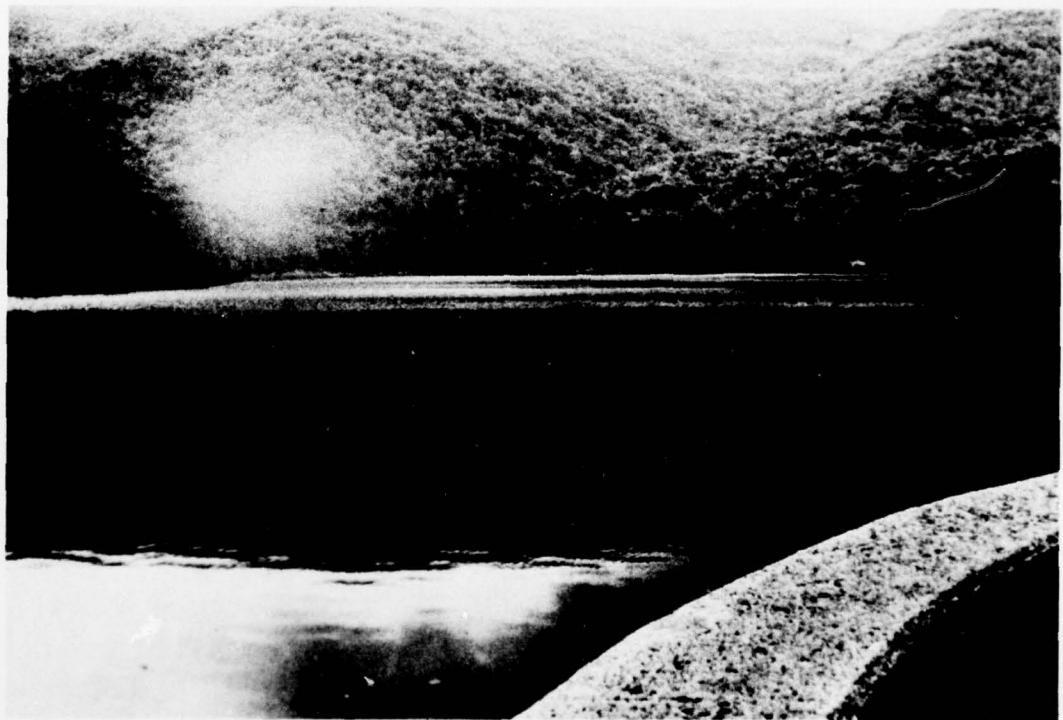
View of 24 Inch Water Supply Main at Exit From Drainage Gallery
